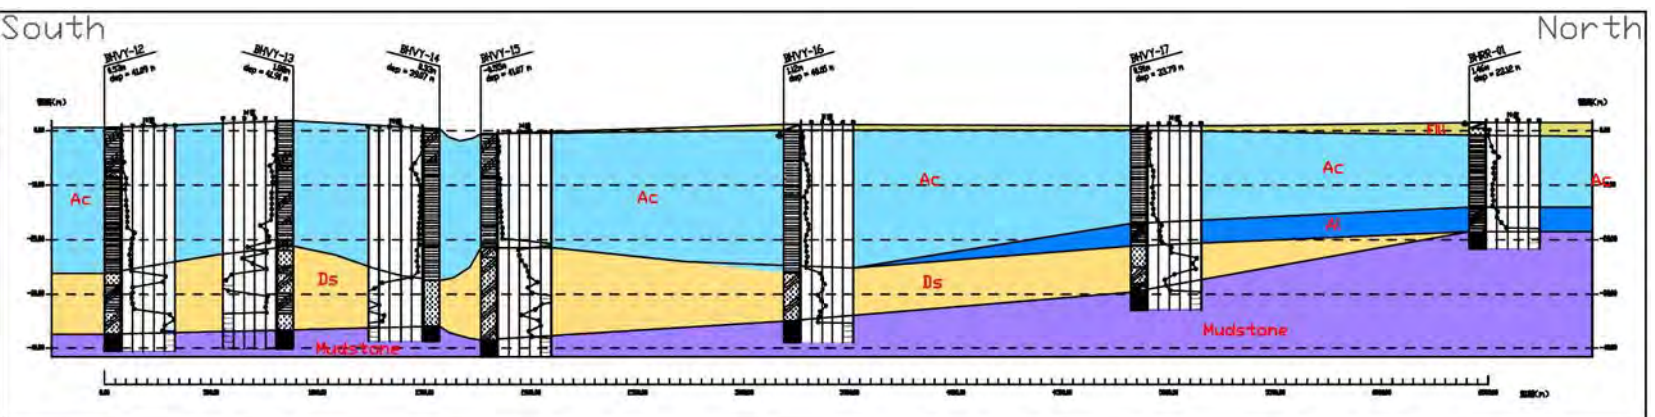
Soil Profile for Vu Yen Bridge Site (from VY-12 to VY-17)
